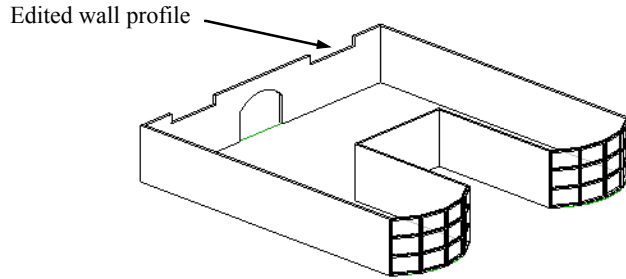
Use the Edit Elevation Profile command to change the wall's profile sketch.
